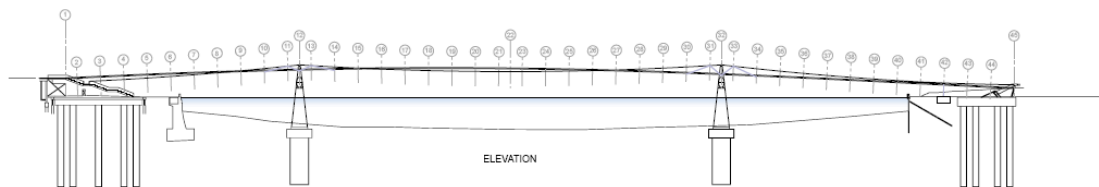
Elevation of the bridge showing the dampers' positions [4].
